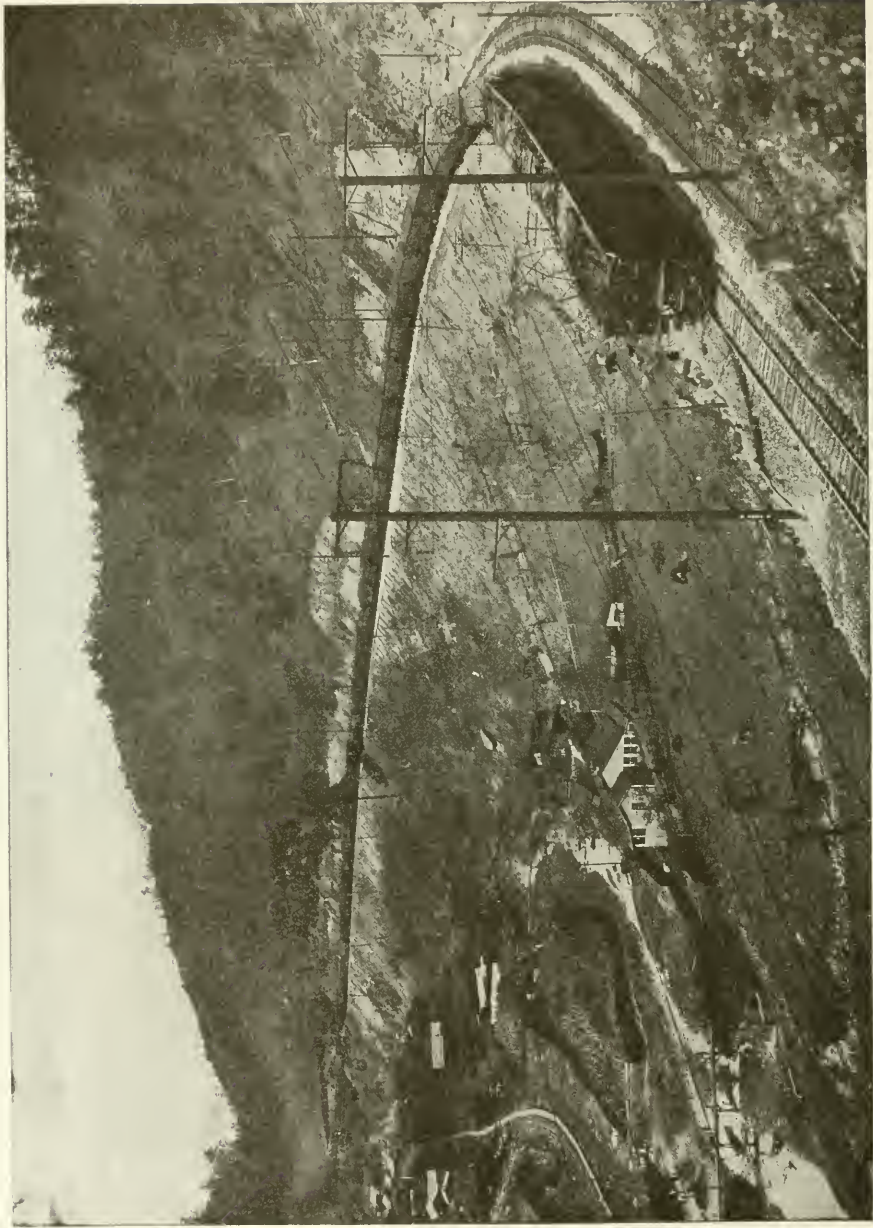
START OF CONCRETE PIPE LINE. Figure 2—VIEW OF STORAGE YARD FOR CONCRETE PIPE. Figure 3—TYPICAL TUNNEL THROUGH ROCK OBSTACLE. Figure 4—VIEW OF SAN FRANCISCO PEAKS OVER RESERVOIR.
